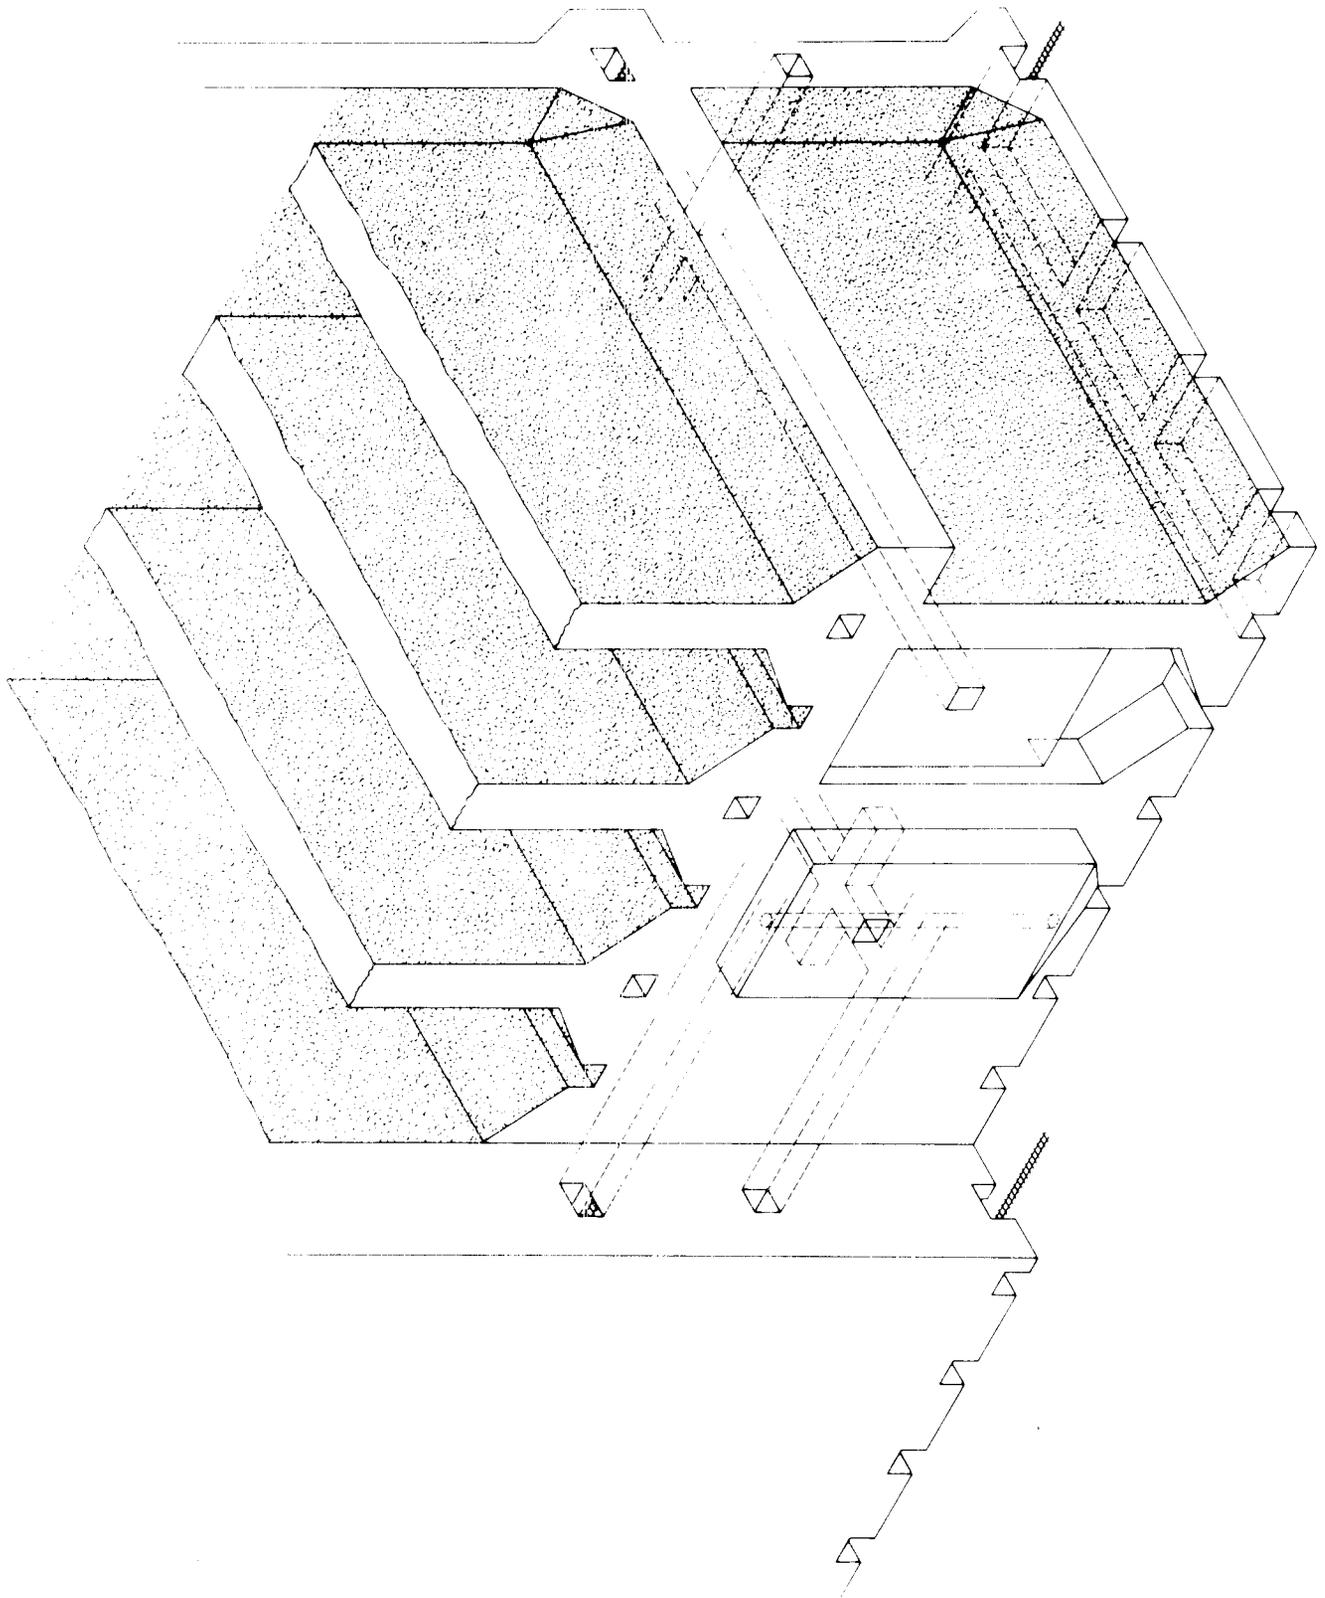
Isometric View Sublevel Stoping with Spent Shale Backfill
